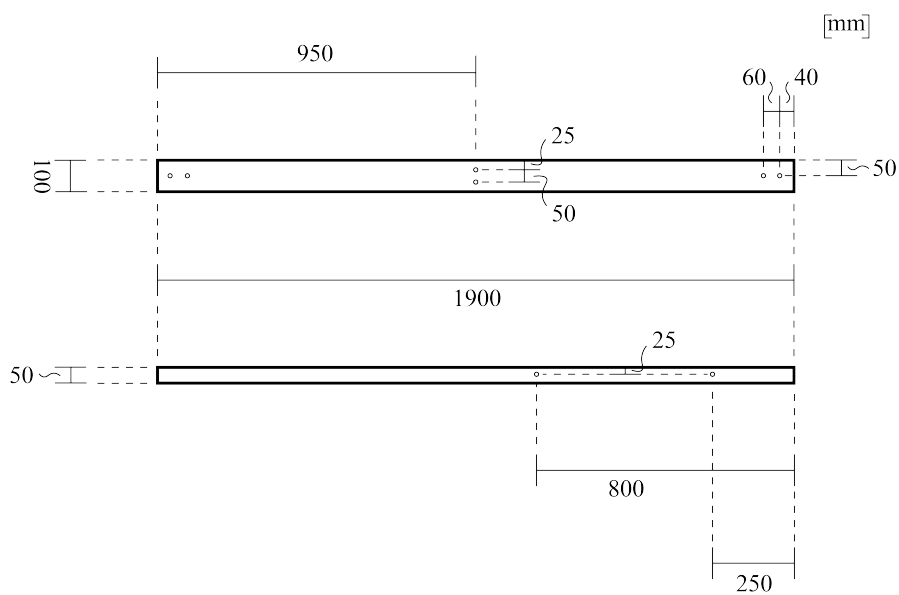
Drawing of a vertical element in the module with measurements assuming that M16 bolts are used.
